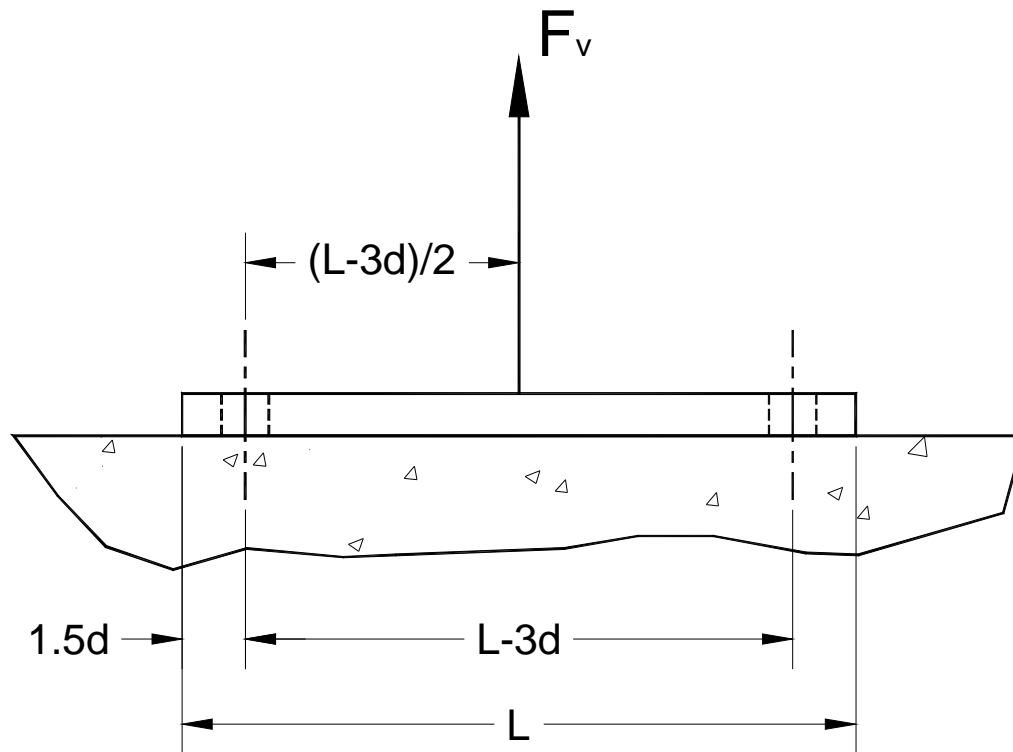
Assumed Base Plate Loading Arrangement for Case 2.
